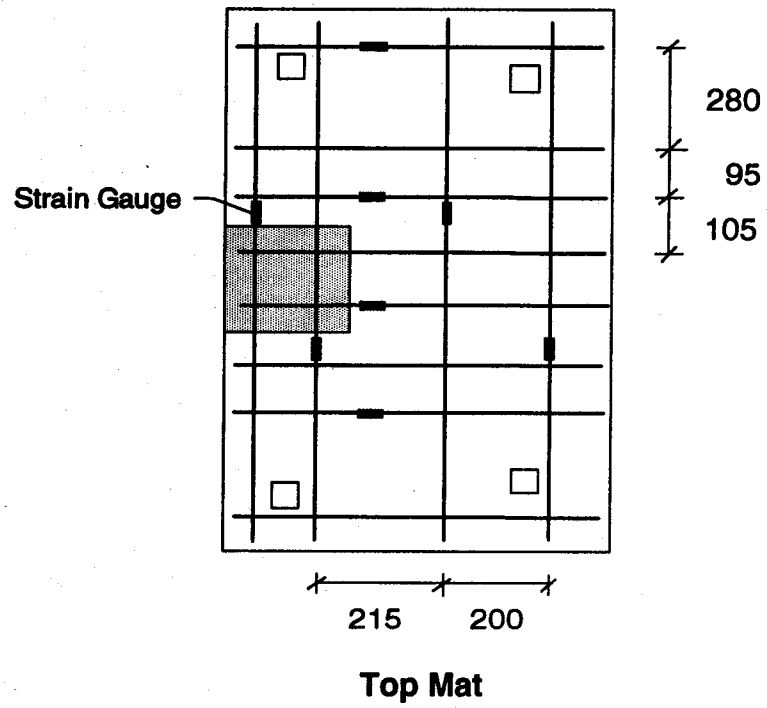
Slab Reinforcement and Strain Gauge Layouts (Series C Specimens)
